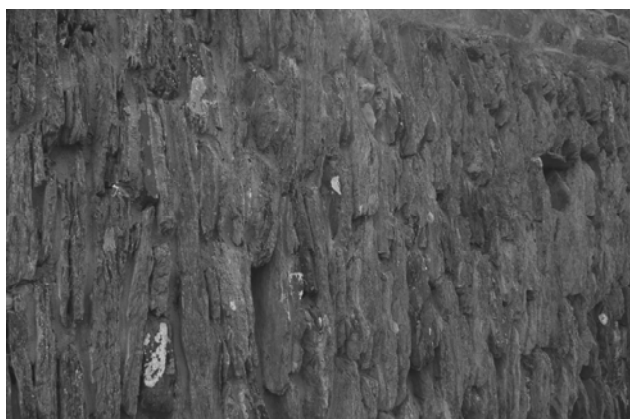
Grouted wall of vertical construction at Port Gavern, Cornwall
